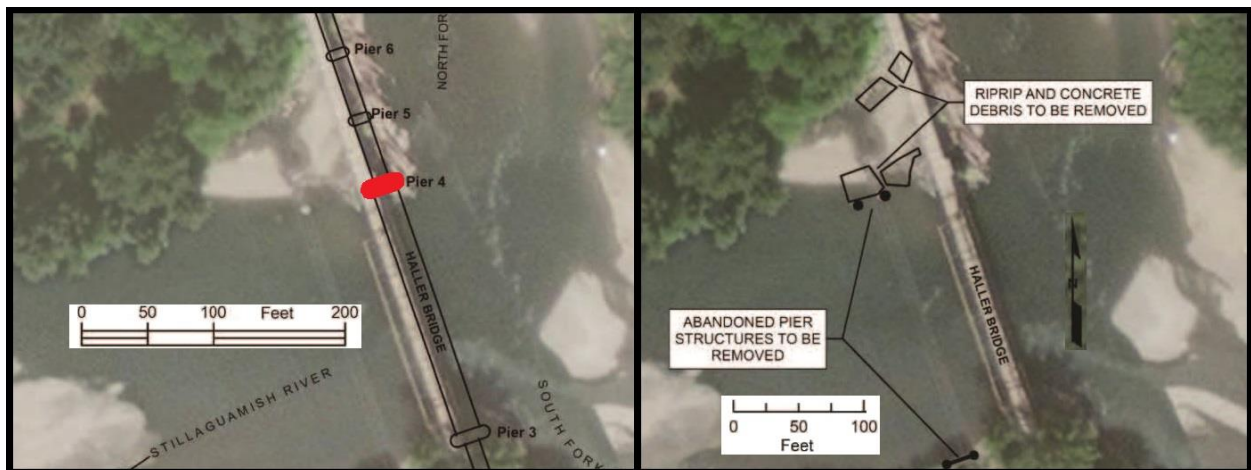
Overhead photographs of the Haller Bridge across the confluence of the North and South Forks of the Stillaguamish River. The left image shows the location of Pier 4 (red oval). The right image shows the location of the in-water concrete and riprap that would be removed as mitigation for the project (Adapted from Figures 2 & 6 in Jacobs 2021a).
